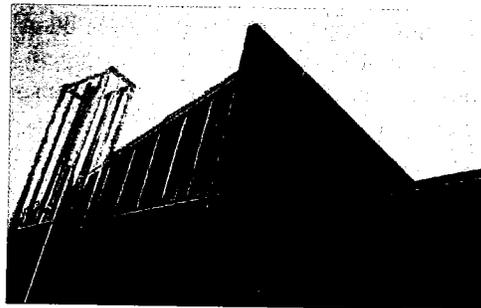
Bringing the wall through the roof line limits fire advancement.
